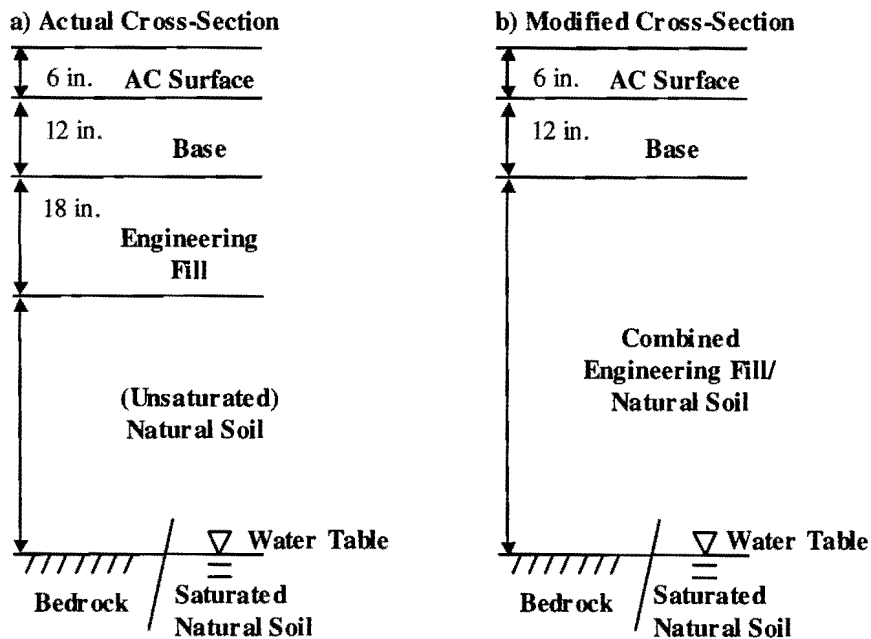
WesTrack Actual Pavement Cross-Section and Simplified Cross-Section Used in this Study
